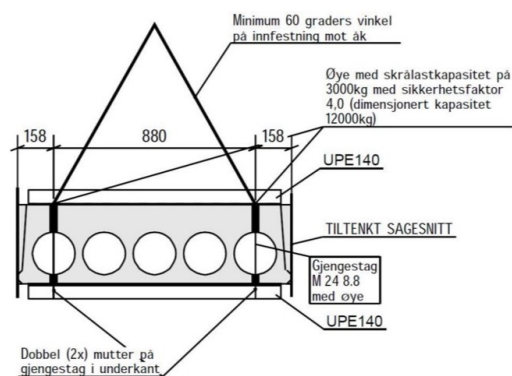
Solution from KA13. Lifting straps mounted through drilled holes and with supporting steel beams
